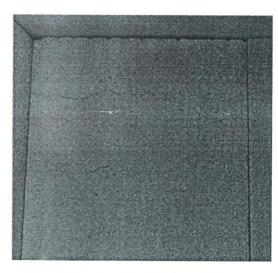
Section of the block wall showing cracks in the concrete blocks.
